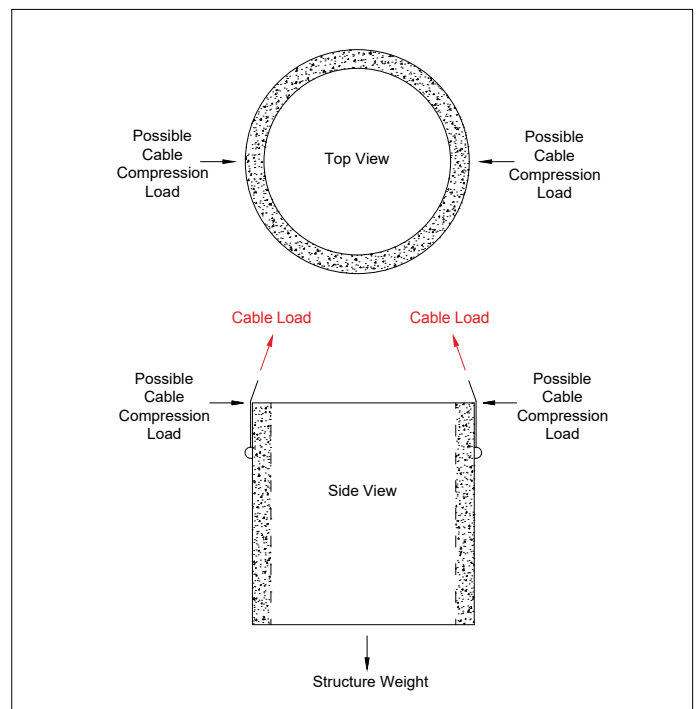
Manhole Riser Possible Handling Loads without Live Loads
